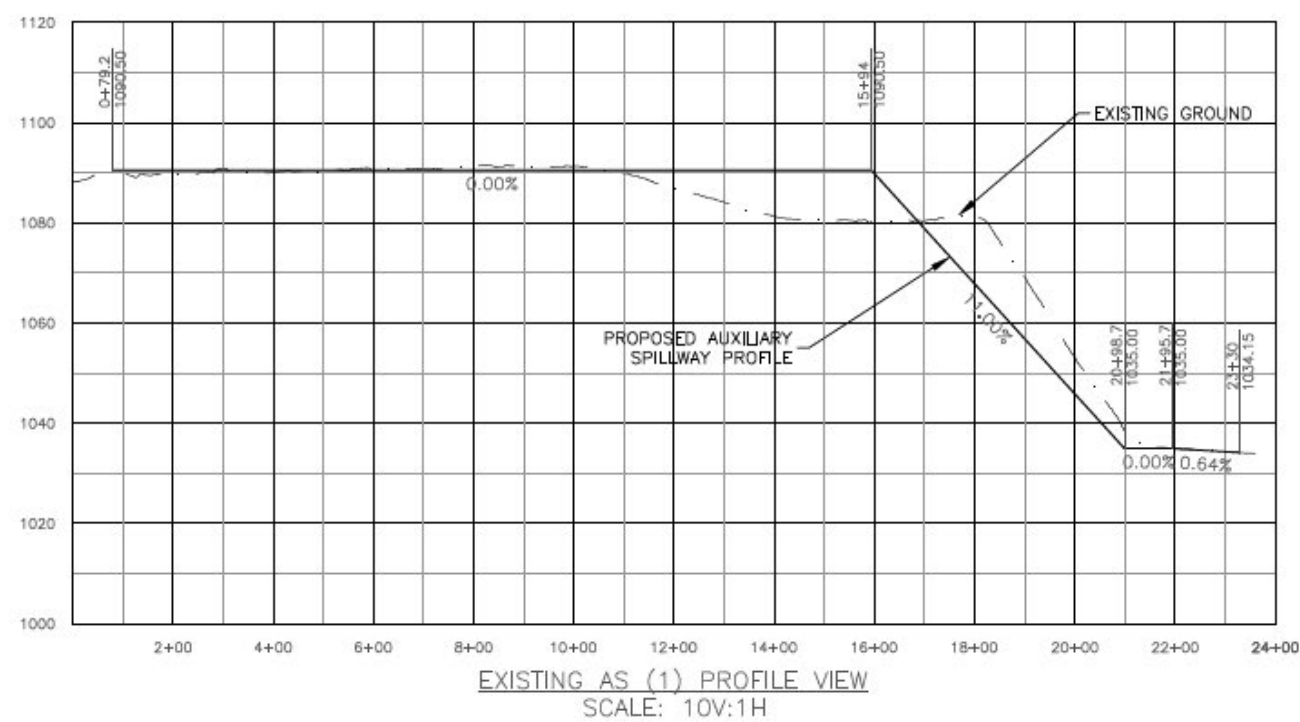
Alternative 2: Armored ACB Conceptual Design Plan & Profile - Keep Bend, 11% Slope
